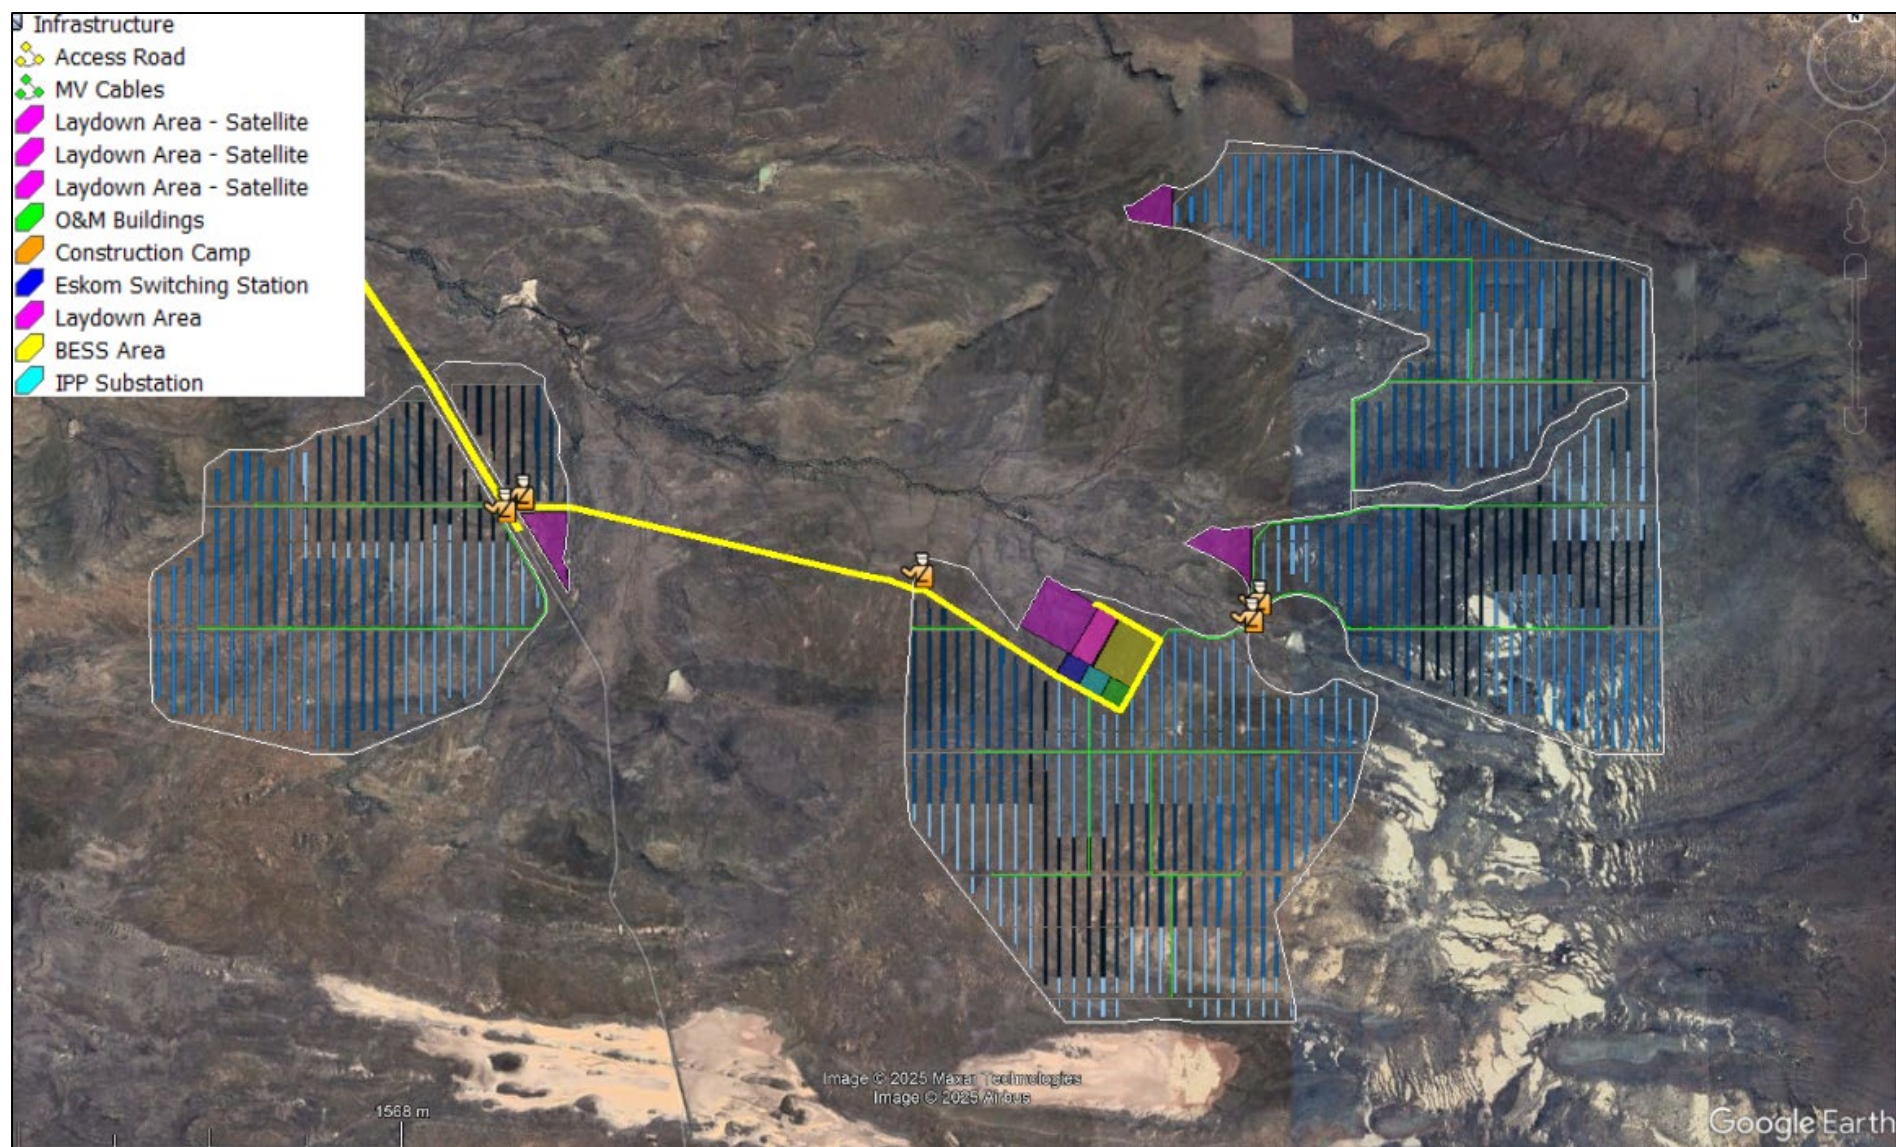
P2AA Proposed Preferred layout plan map exclusive of grid connection routings.
